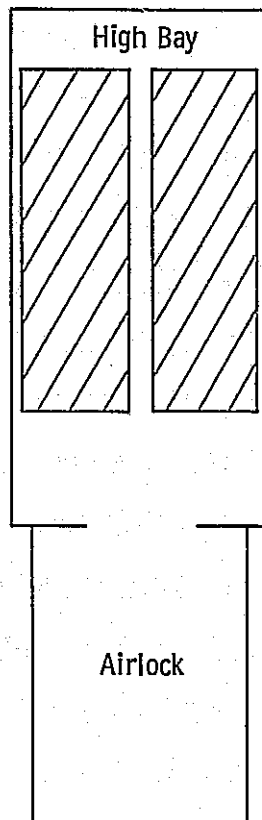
KSC Facilities - O&C High-Bay Layout
